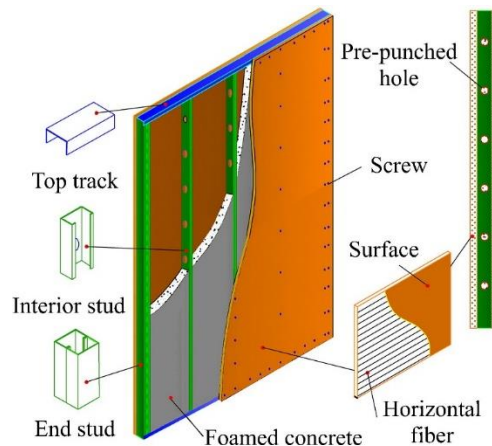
CSHLFC Detail (Xu et al., 2018).
